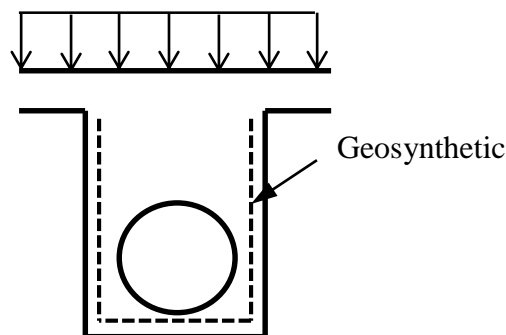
Trench Reinforcement (Jeypalan, 1983)
